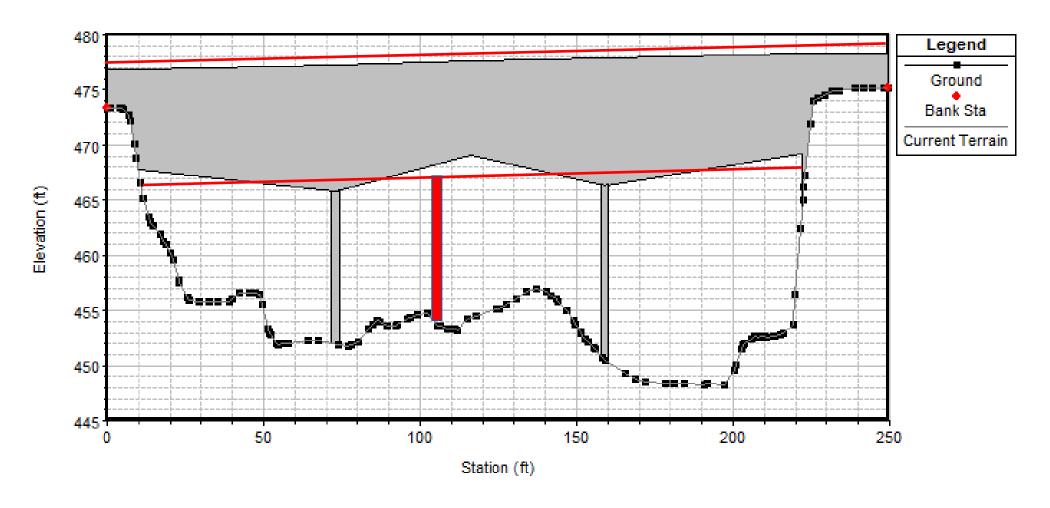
Model Representation of Existing and Proposed Bridges (gray for existing bridge and red for proposed bridge)
